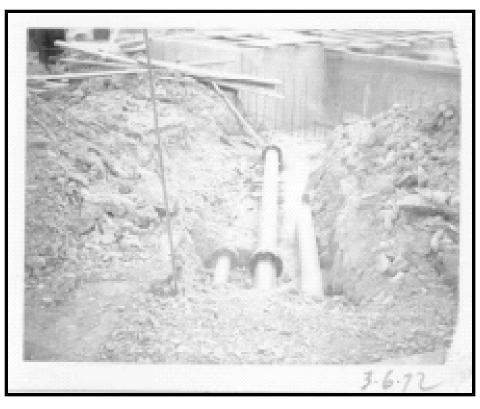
March 6, 1972 photo. View looking southwest toward the northeast corner of the EQ tank. The three pipes are presumed to be from Bldg 2 WW tank area. Rebar from Neutralization tank wall construction in background.
